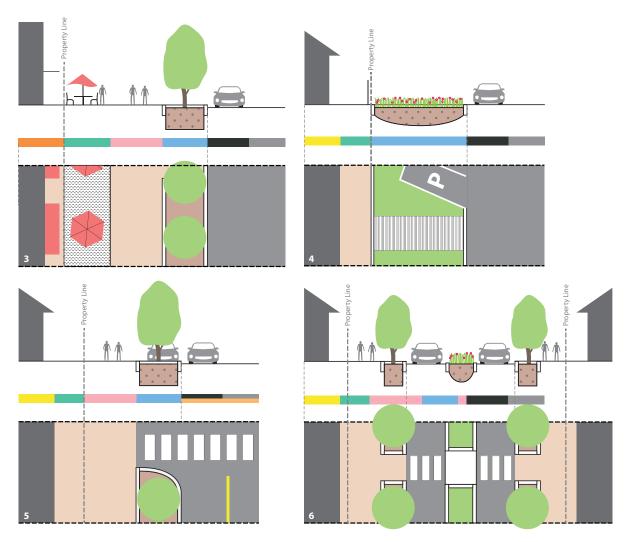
Examples of Green Street practice (Cont'd): 3. Green Street with outdoor activity area in conjunction with sidewalk; 4. Green Street with wider and leveled stormwater planter; access to the building; and diagonal parking space; 5. Green Street with extended stormwater planter for traffic calming; 6. Green Street with stormwater planter in median for safe crossing.
